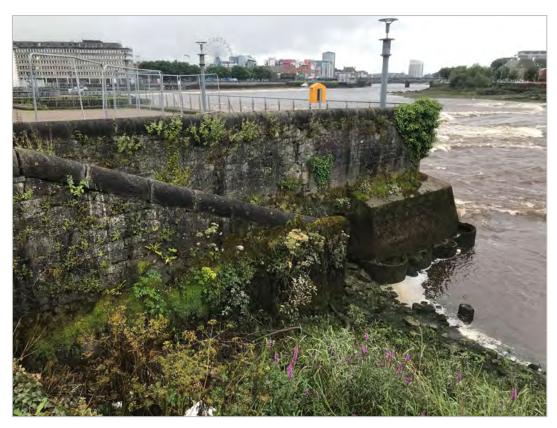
View from northern end of survey area looking north towards Thomond bridge with King John's Castle and riverbank to right.
